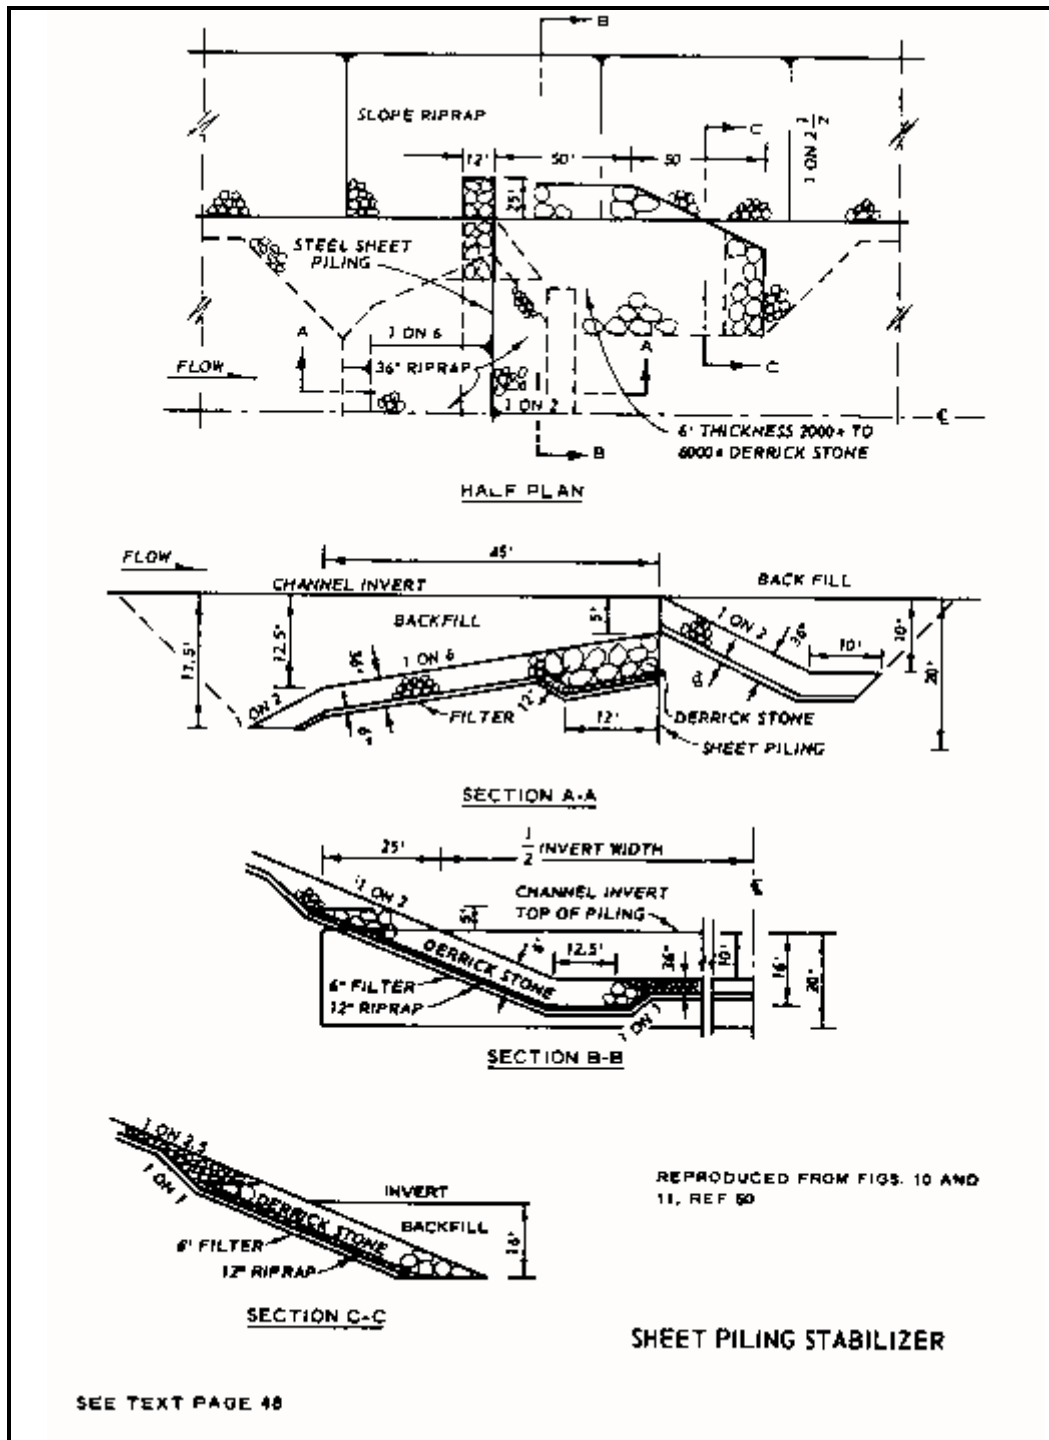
Bed Stabilizer Design with Sheet Pile Cutoff (U.S. Army Corps of Engineers, 1970)
